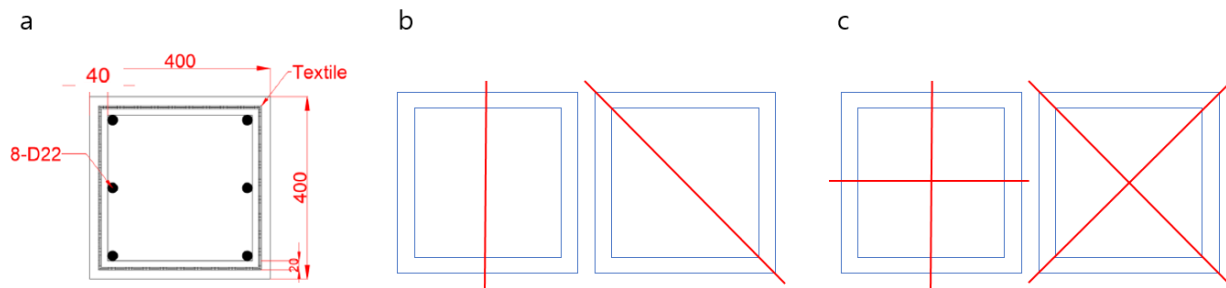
Review of Module Division Alternatives of Textile Reinforced Concrete: (a) no division (53kg); (b) 2 sections (27kg); (c) 4 sections (13kg)
